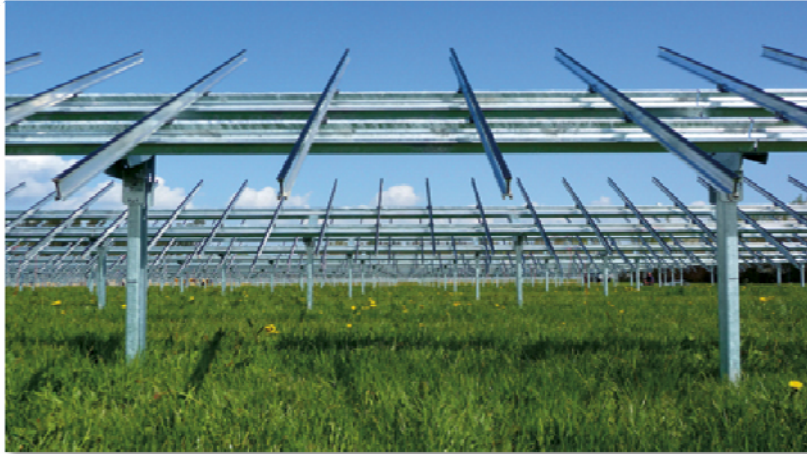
Potential supplier Habdank's PV panel mounting structure (Source: www.hpvm.com)
